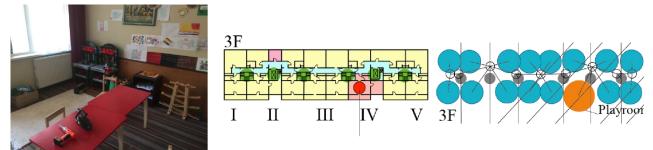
Internal PA space example (a) photo; (b) floor plan; (c) spatial analysis visualisation
